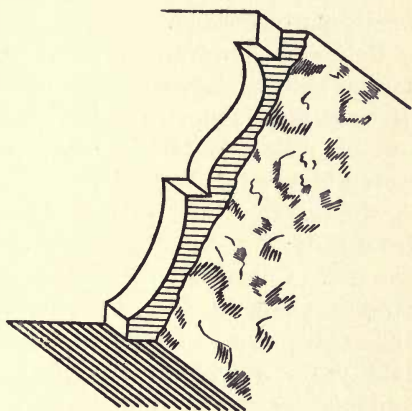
Marble Hord (Starting of Machine-cut Mouldings).
